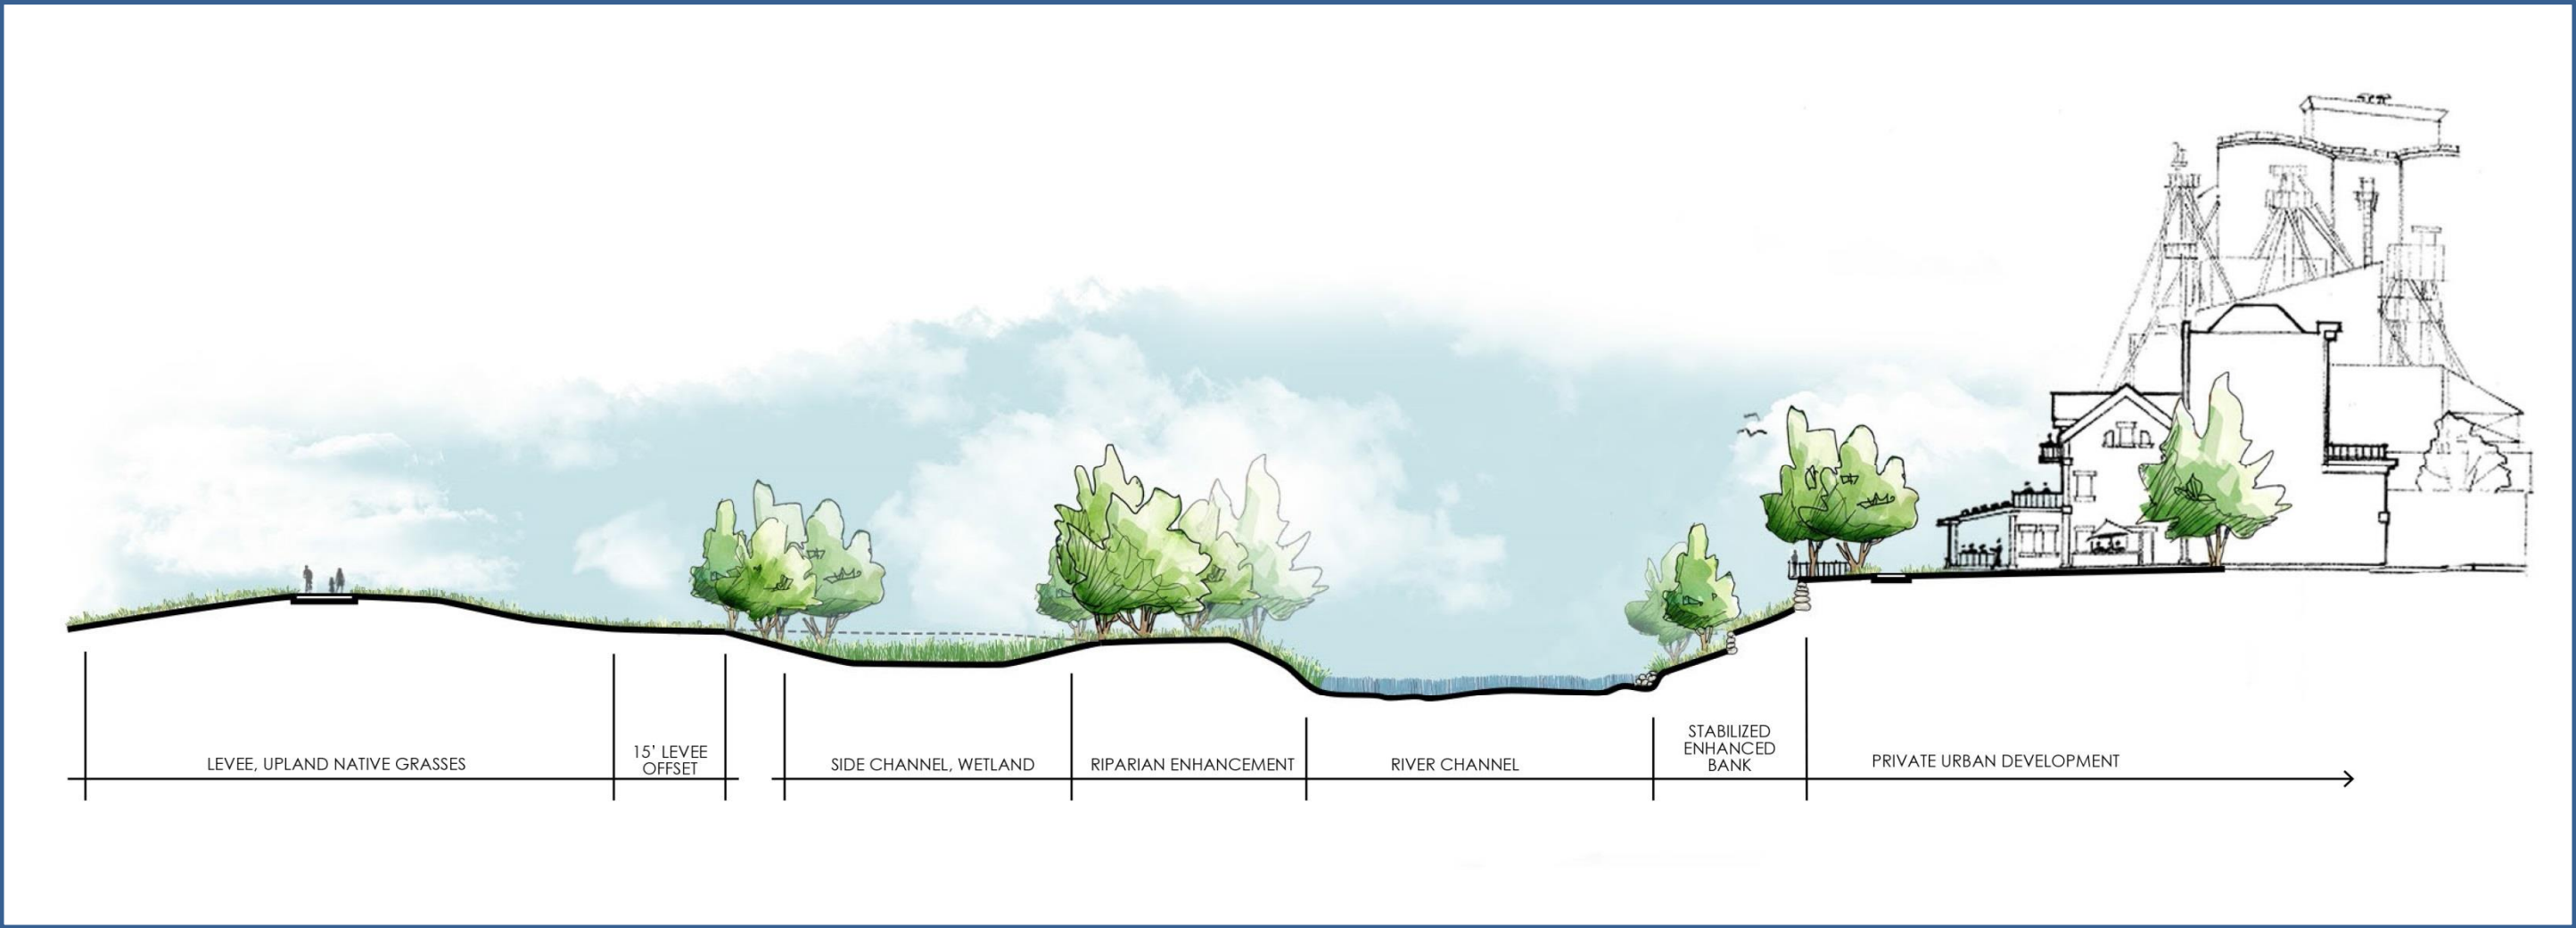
Cross Section between Linden Street and Lincoln Avenue (Looking Downstream) Illustrating the Side Channel and the Terraced Southwest Bank
